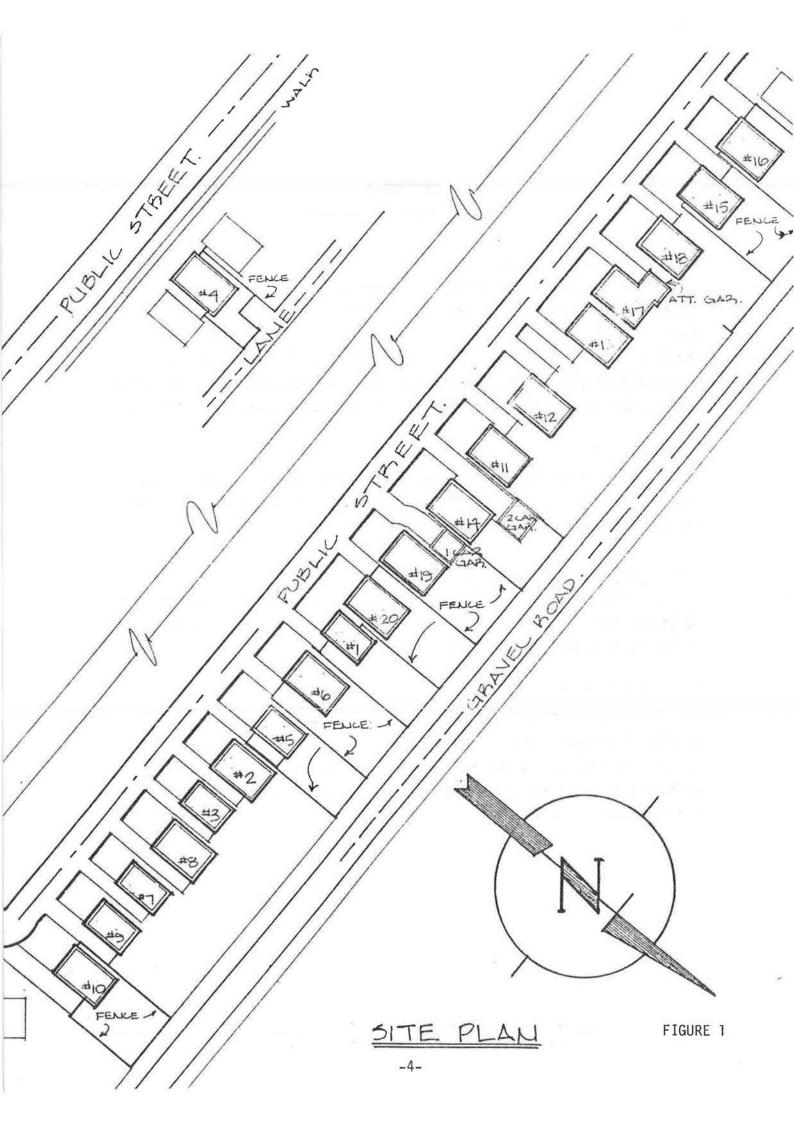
shows the project site plan. Nineteen of the houses are located side by side with the 20th located approximately 1 km away. All the project houses face south.
